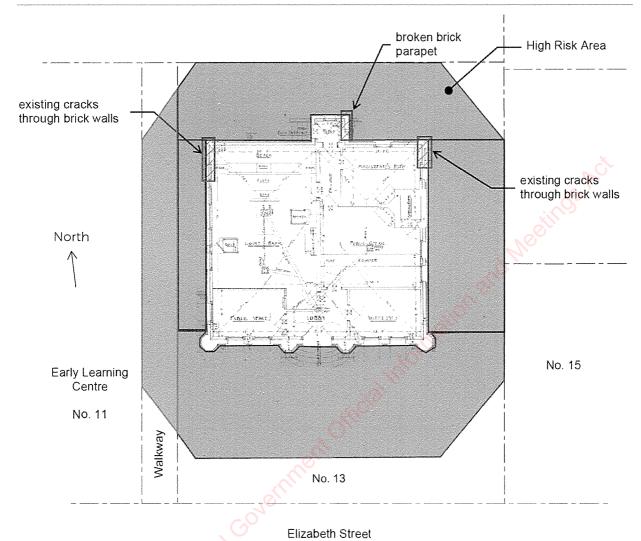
Site Plan of 13 Elizabeth Street, Petone showing extent of High Risk Area
